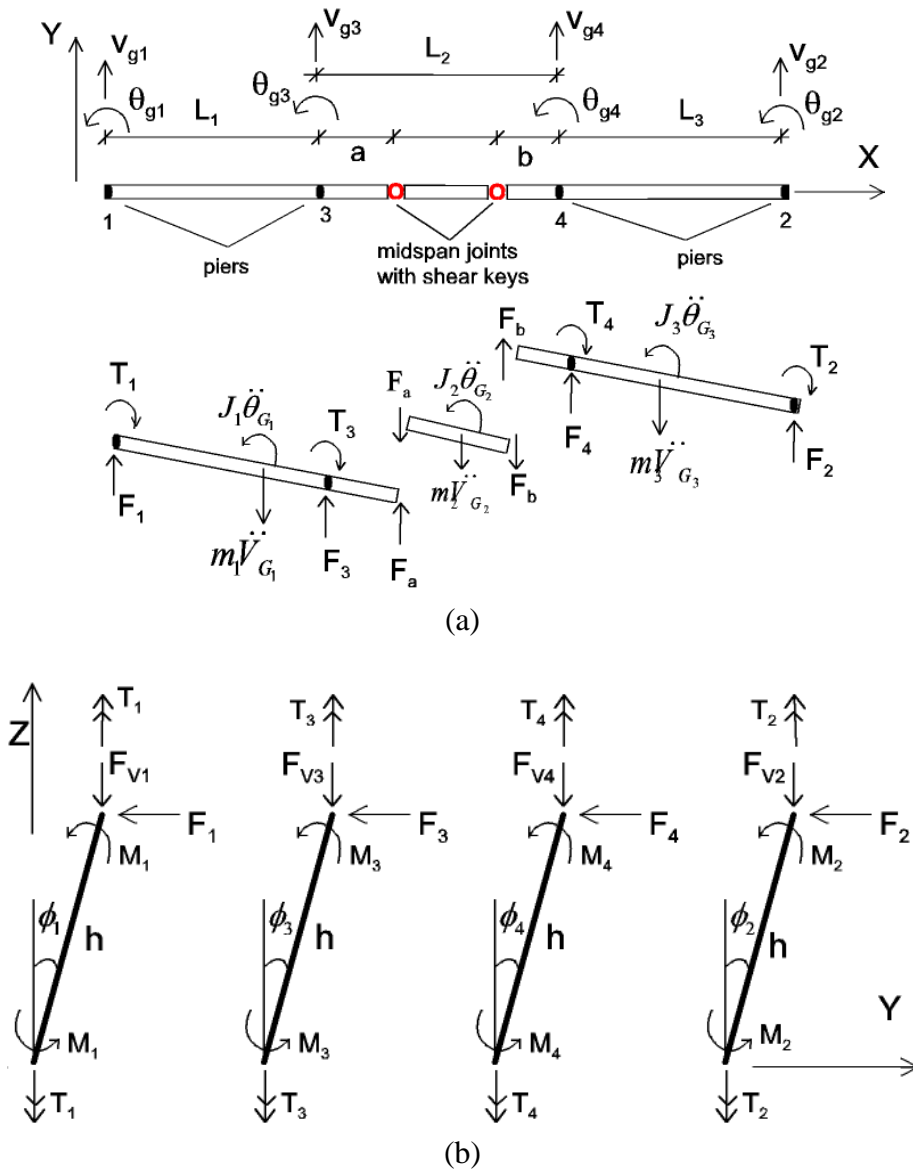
(a) Plan view of the bridge; (b) Side view of the bridge piers and of the forces acting on them
